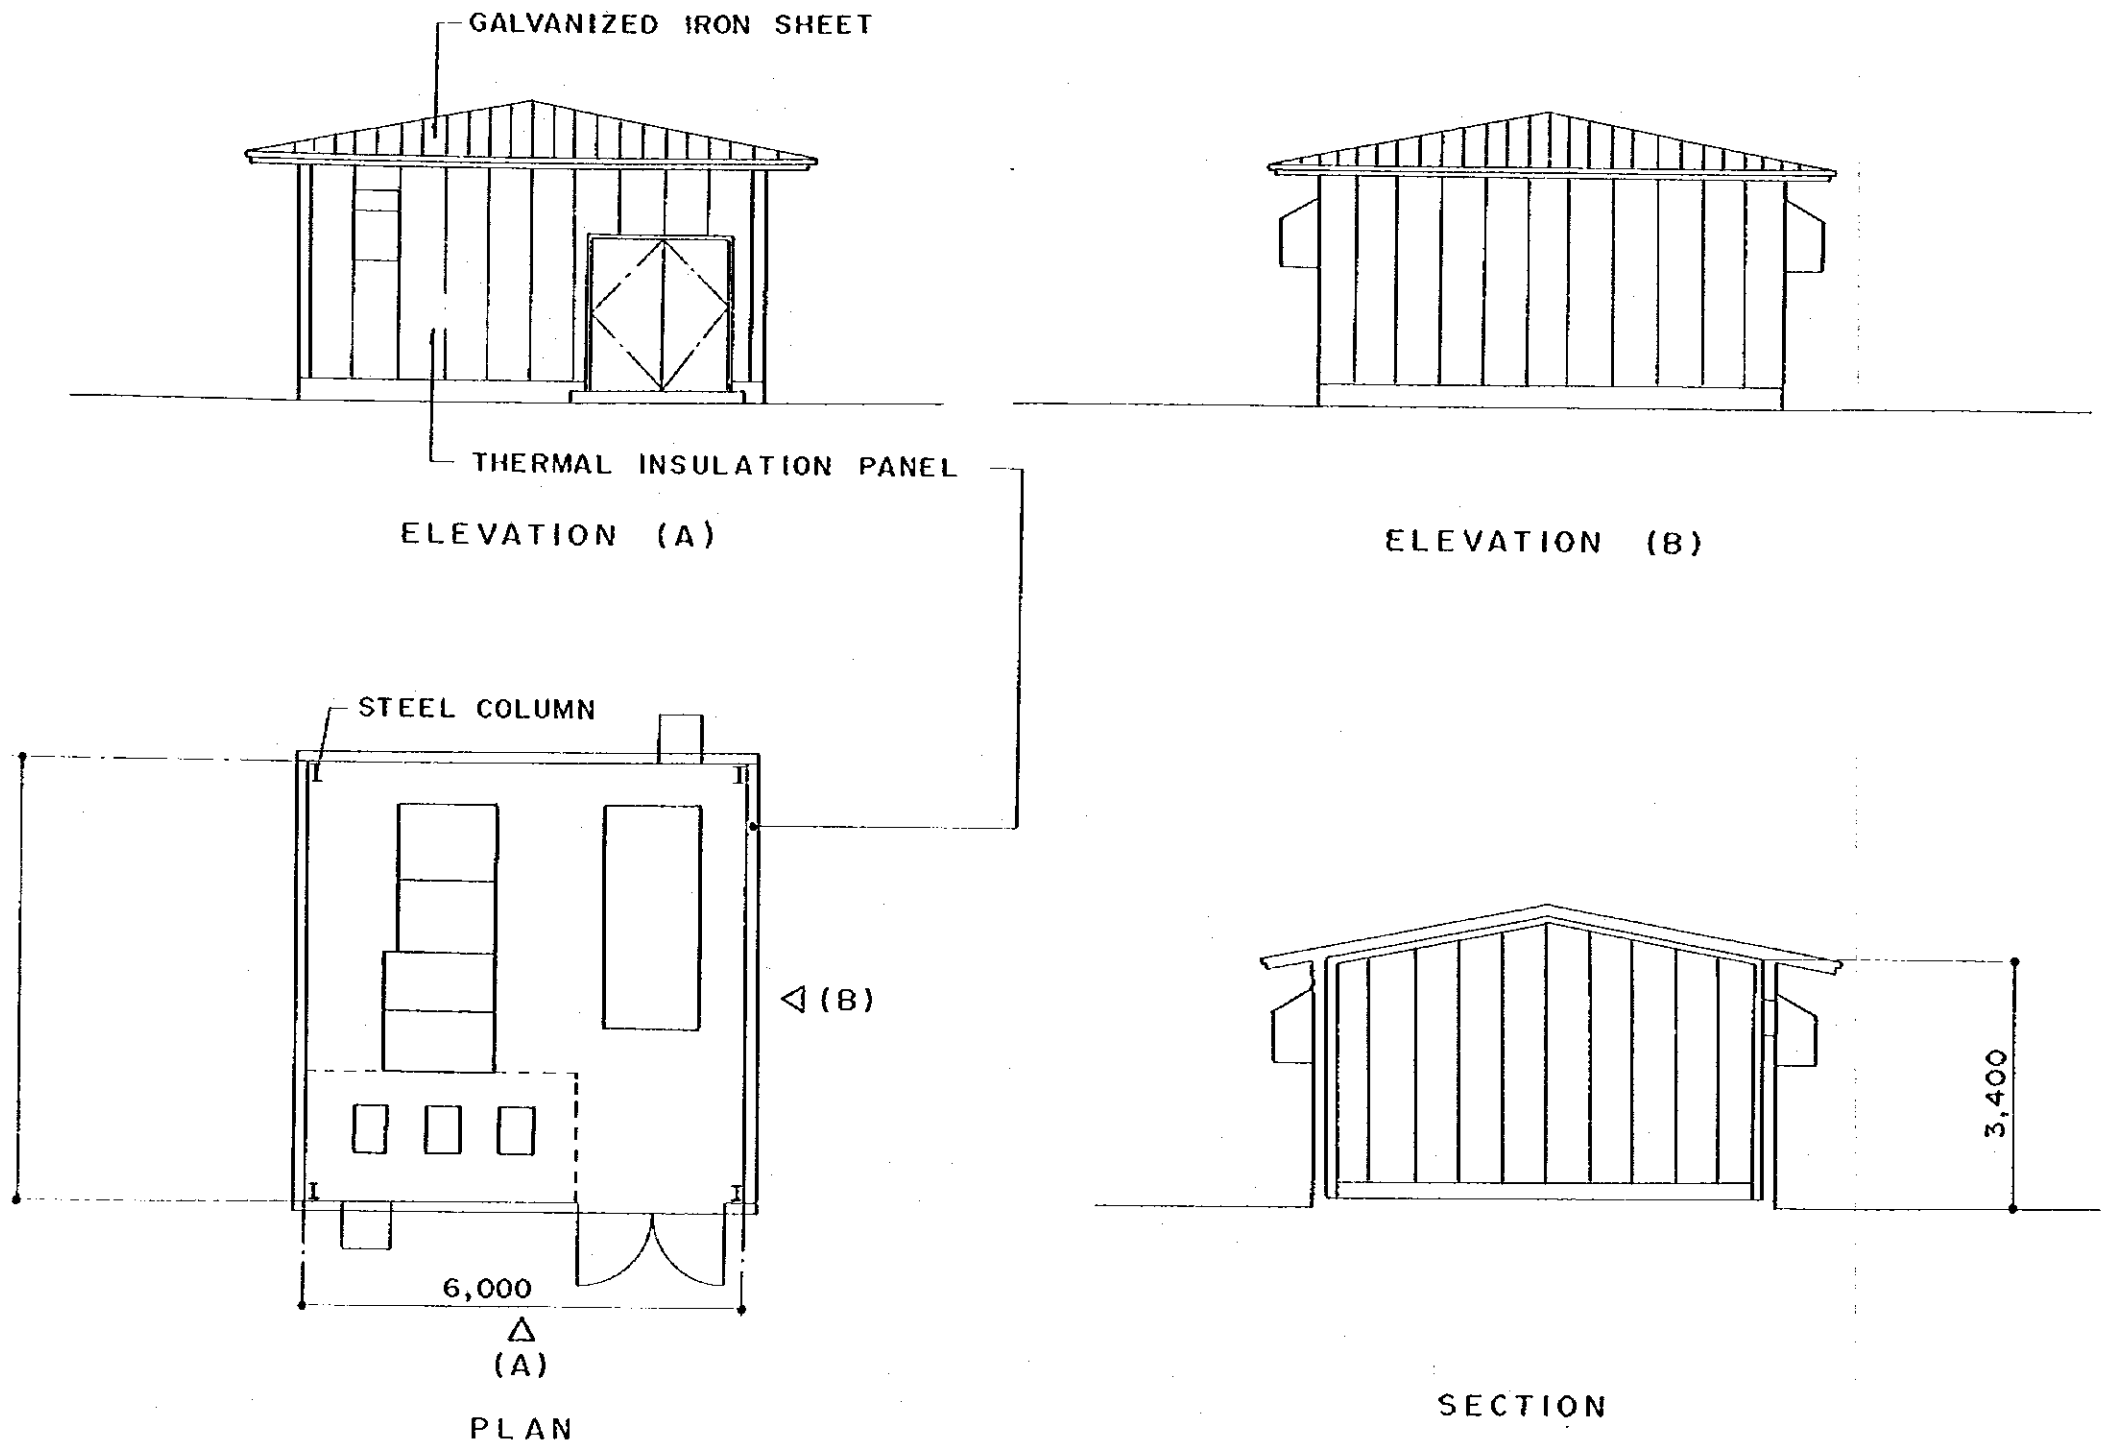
Layout of Power house (Gbarnga, Bachanan, Bomi Hills)
